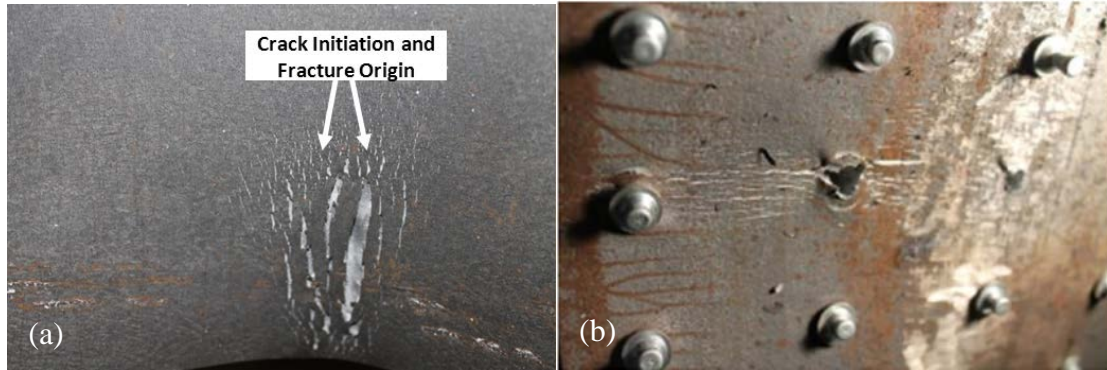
Crack Initiation and Failure Origin at the Flange Surface Before Fracture Occurrence for Specimen 7 (a) and Specimen 12 (b)
